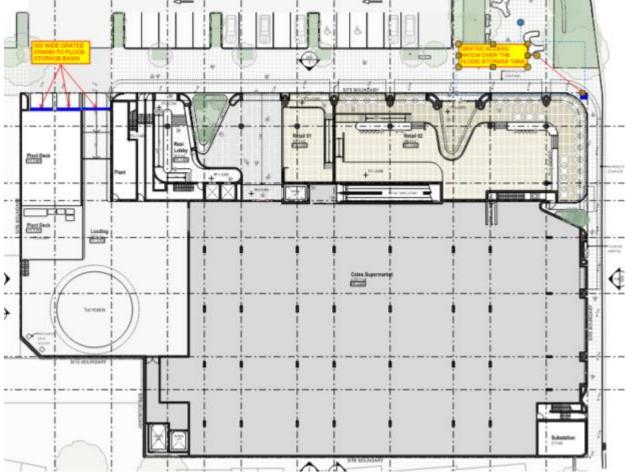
Proposed Location of Inlets for floodwater (Ground Floor)
